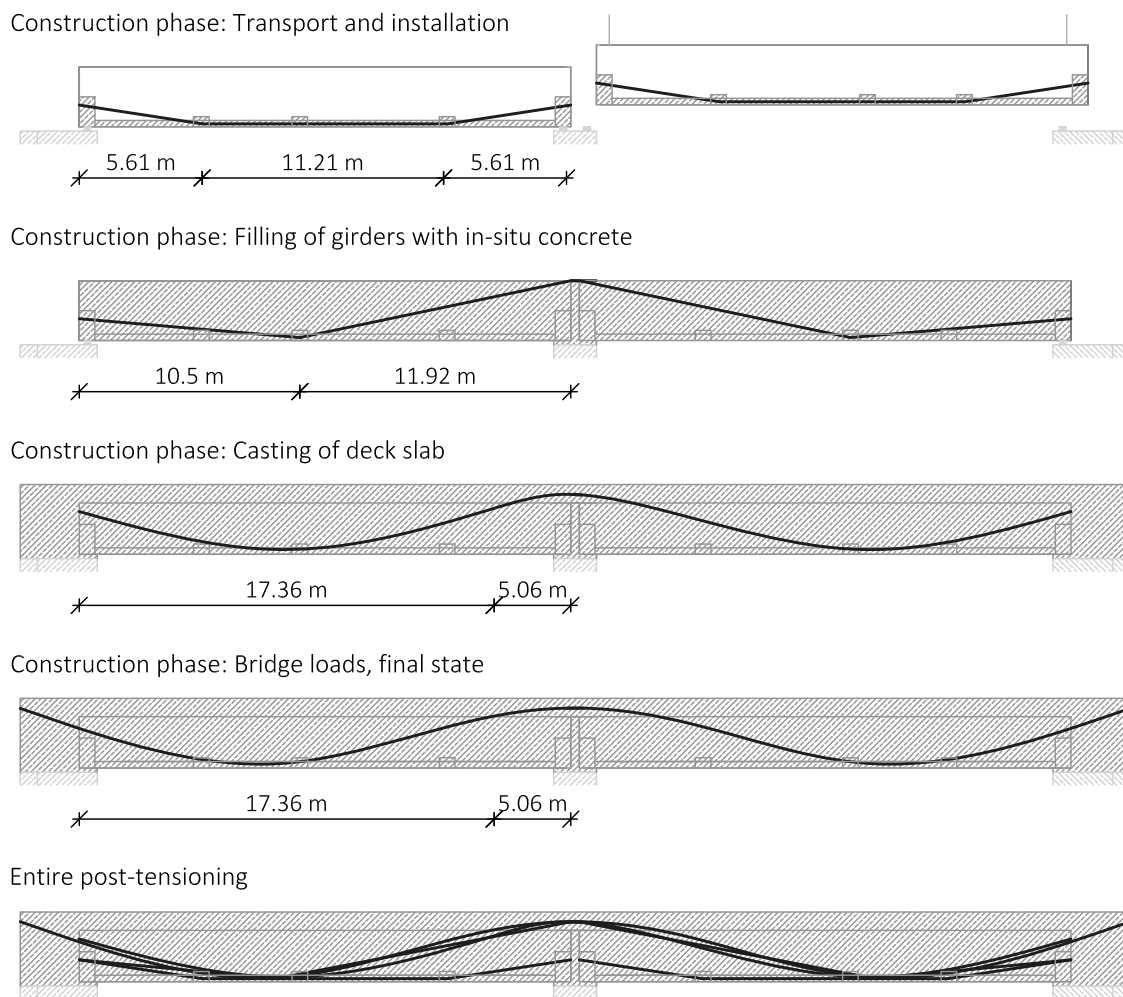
Tendon elevation in each construction phase of the redesigned A2.Ü22a Overpass
